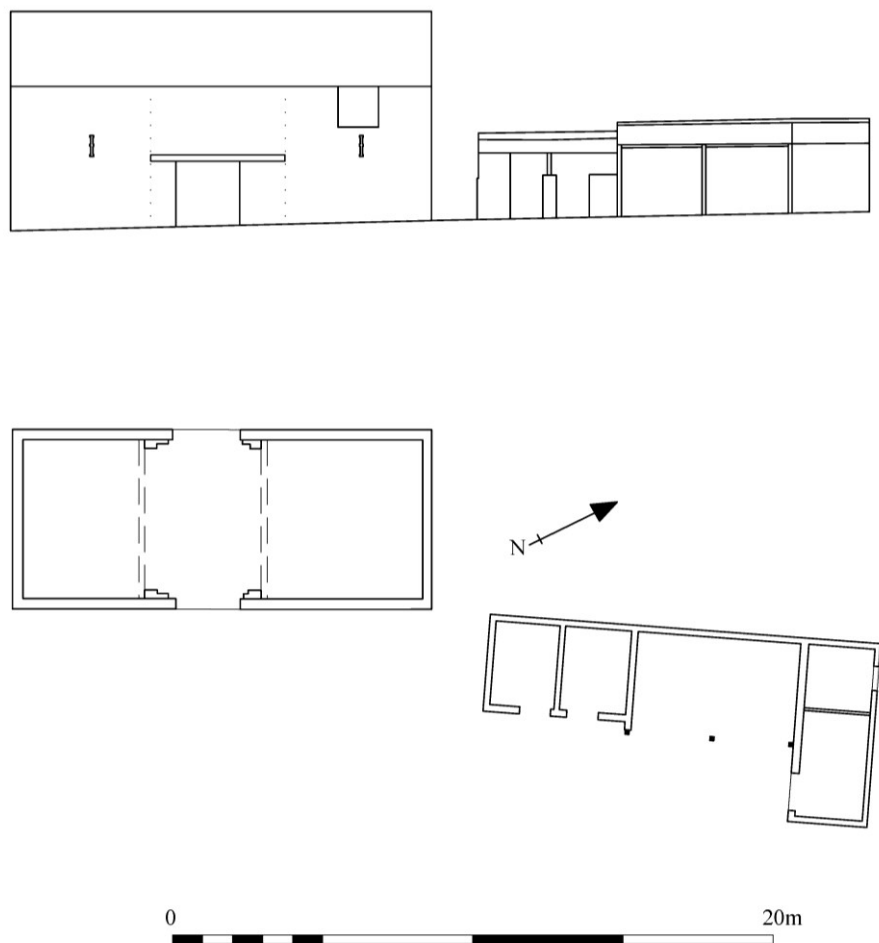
Unit 2, Barn and outbuildings south-east facing elevations and plans
